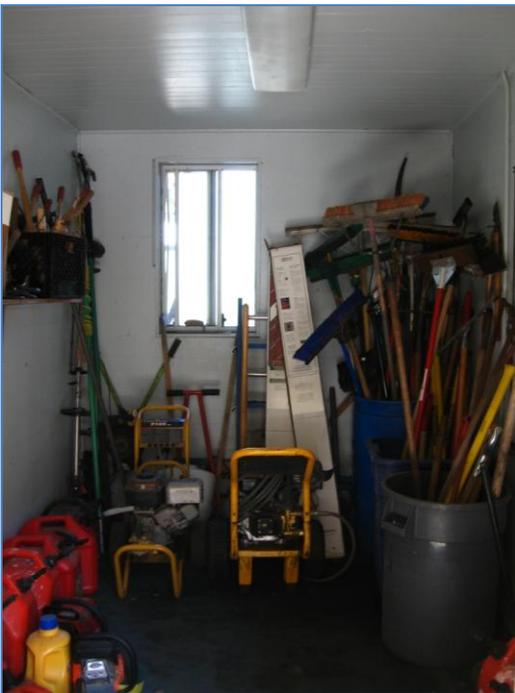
Detail of the small room in the north corner of the building that has been subject to extensive remodeling.
